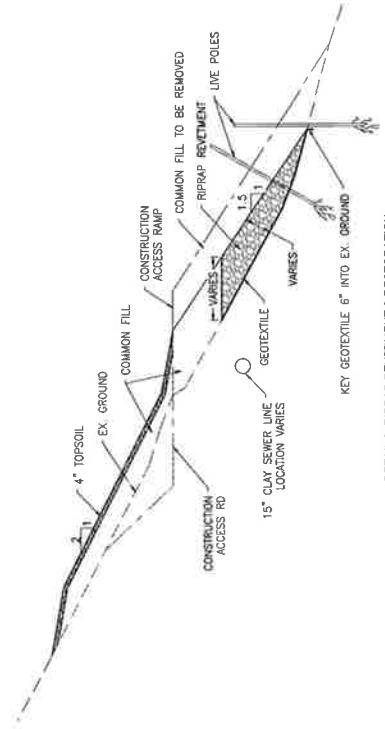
CONSTRUCTION ACCESS ROAD RESTORATION
